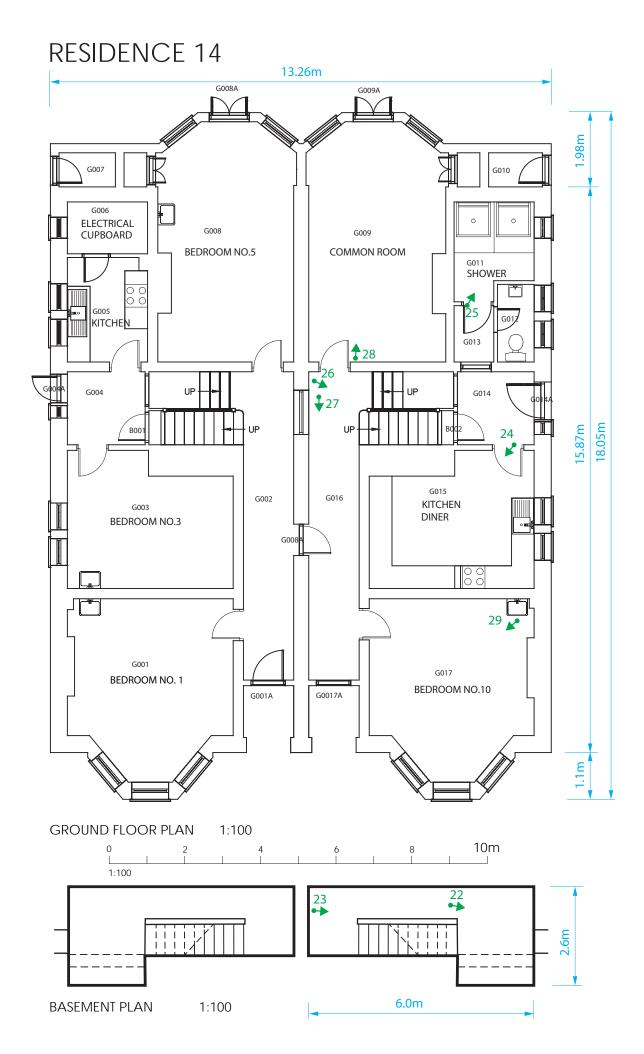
Ground floor and basement plan of Residence 14 showing plate location (green arrows)
